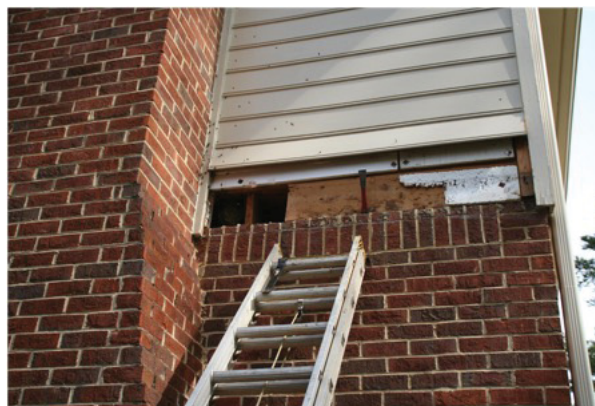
Image of residential construction where the exterior cladding, in this case wood-siding, was removed in addition to a section of the joist header to gain access to a colony. This is a two-story house and bees gained access through a crack between the brick and siding and built a comb between the joists supporting the flooring of the second story
